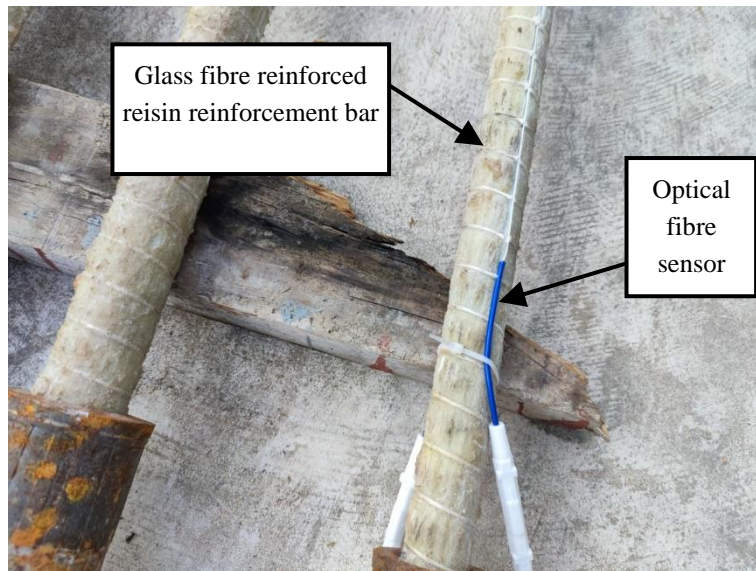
Glass fibre reinforced resin reinforcement bar fitted with optical fibre sensor used in site trial
